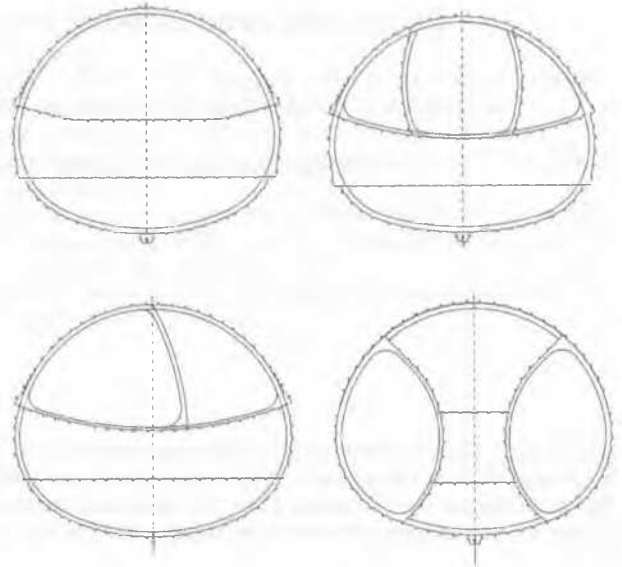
Excavation schemes: (1) top heading, (2) middle adit, (3) asymmetrical adit, (4) side gallery,
